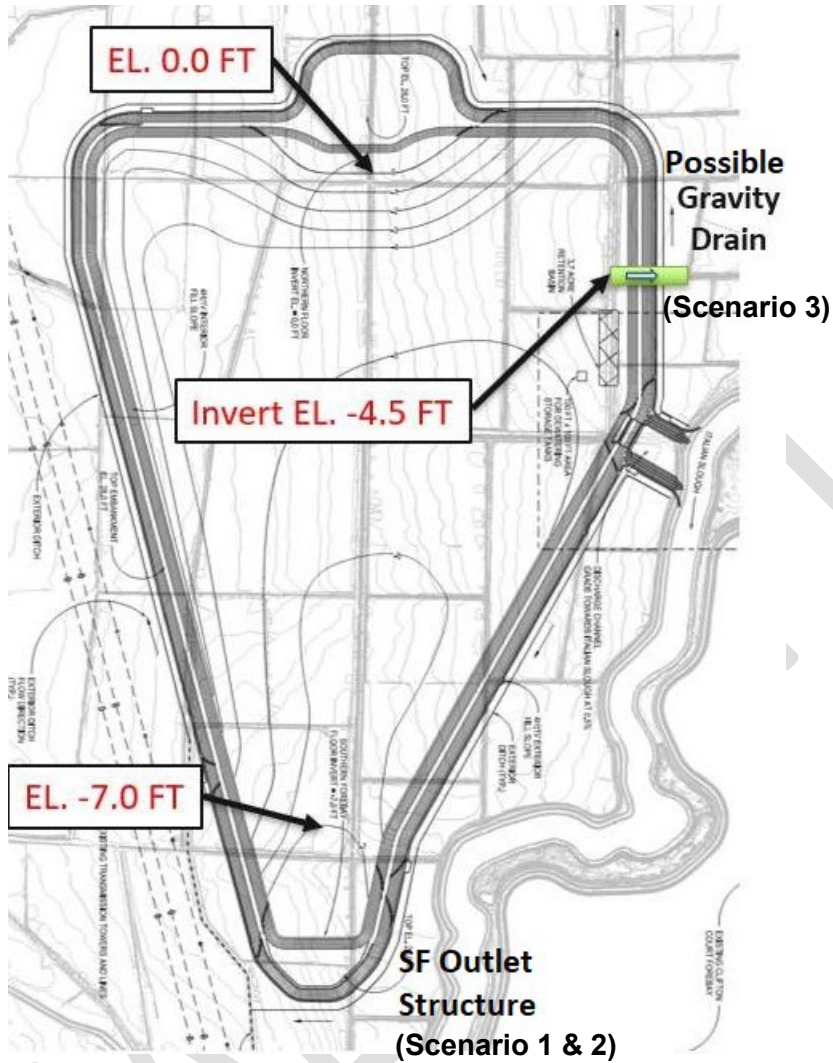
Proposed Supplemental Dewatering Locations within the Southern Forebay
